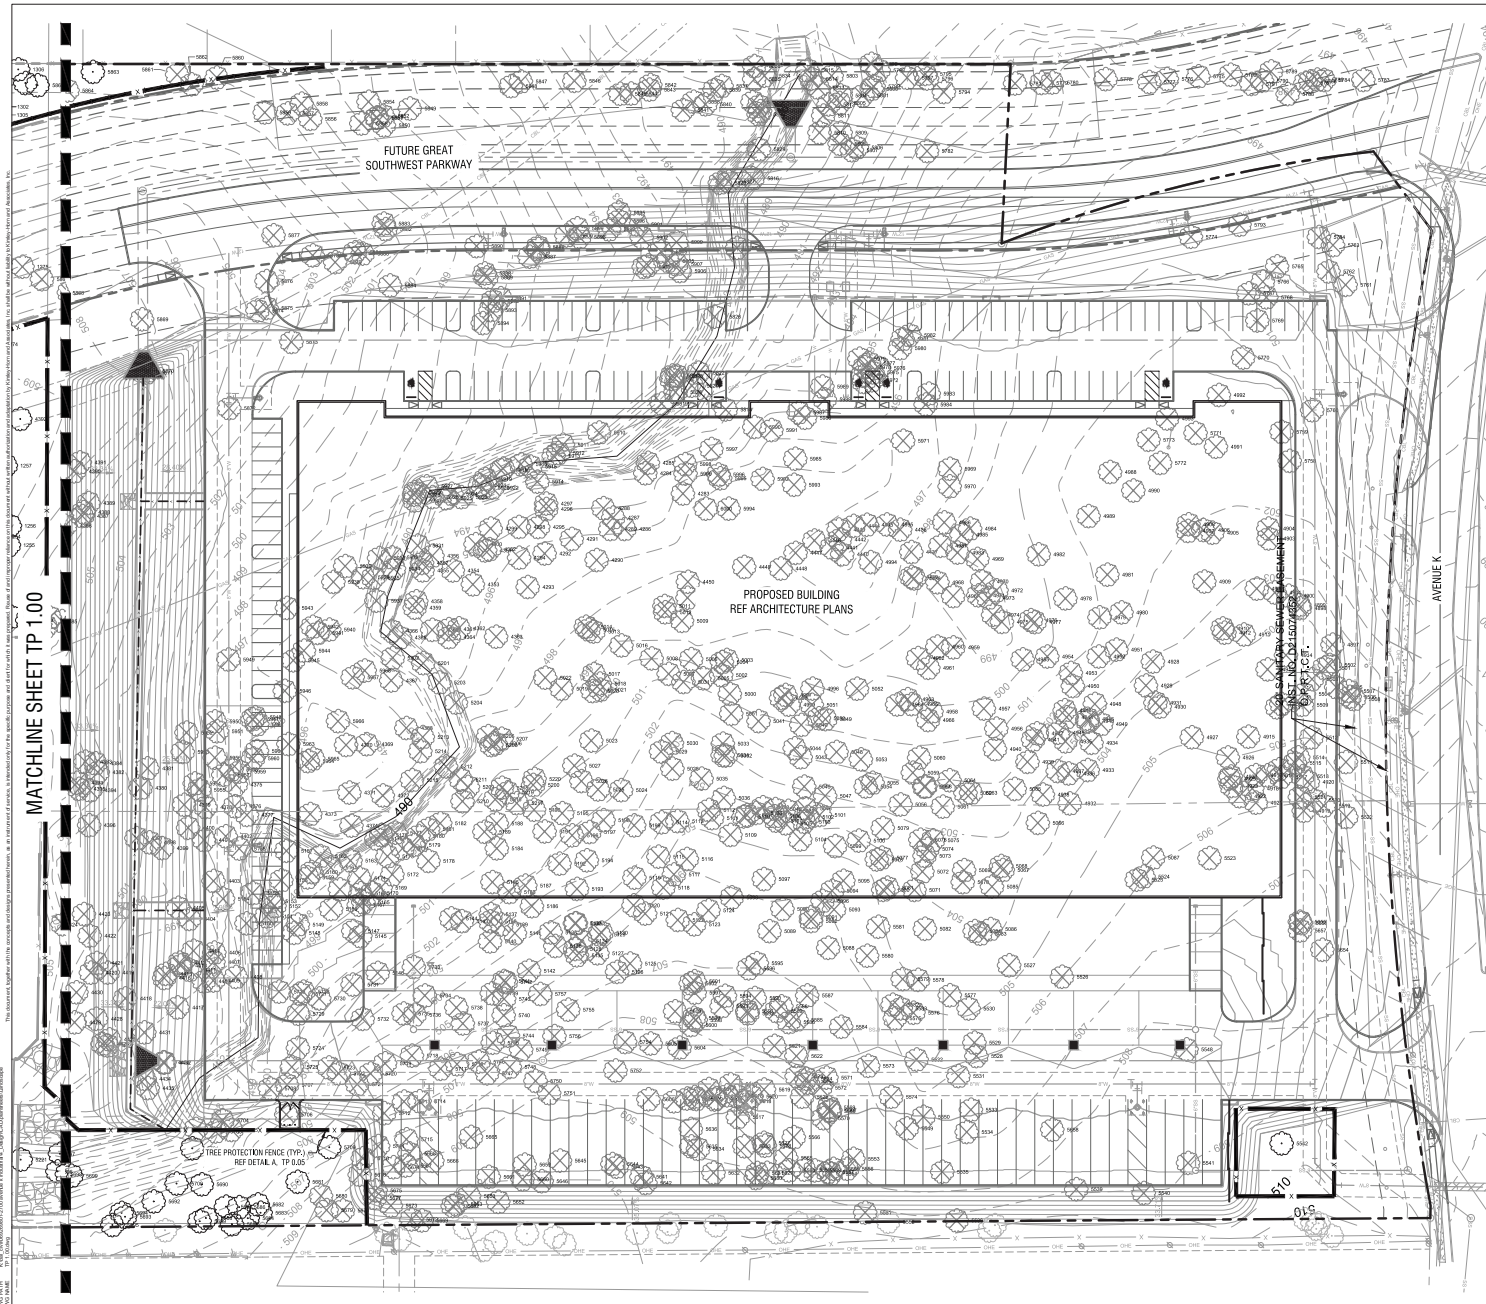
# EXHIBIT D - TREE PRESERVATION/PROTECTION PLAN
